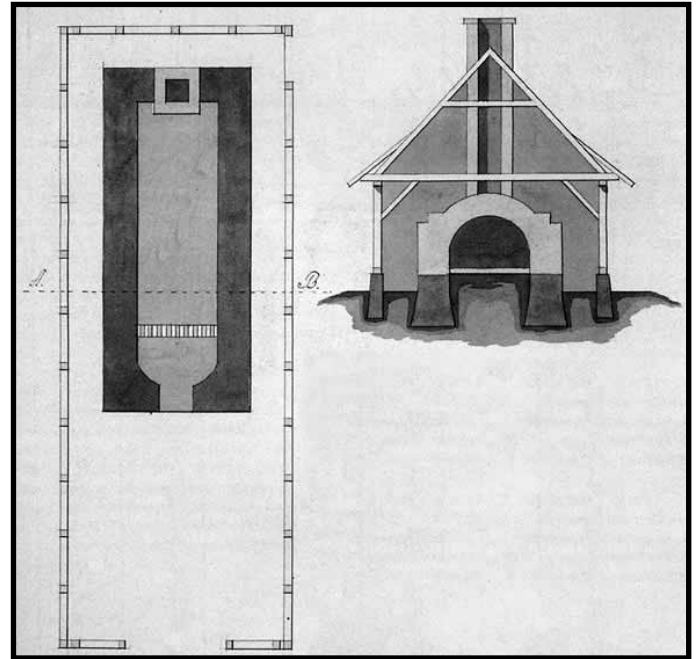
Horizontal cross-draught earthenware kiln with a rectangular ground plan and a vertical fire-grate. Brakelsiek, Nordrhein-Westfalen D, Mörtz, 1826 (Halle/Rinke 1991, 117).
